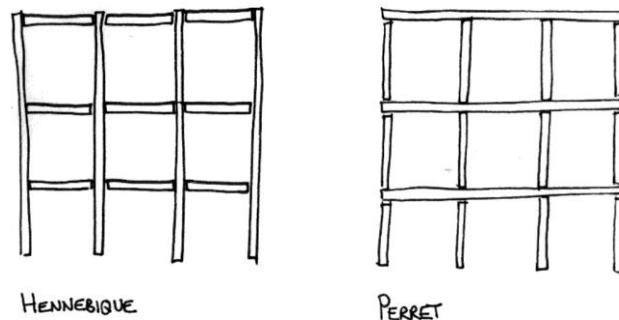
In the Hennebique system, columns are cast the height of the building whereas Perret turned this on its side casting the beams across the width of the building.
